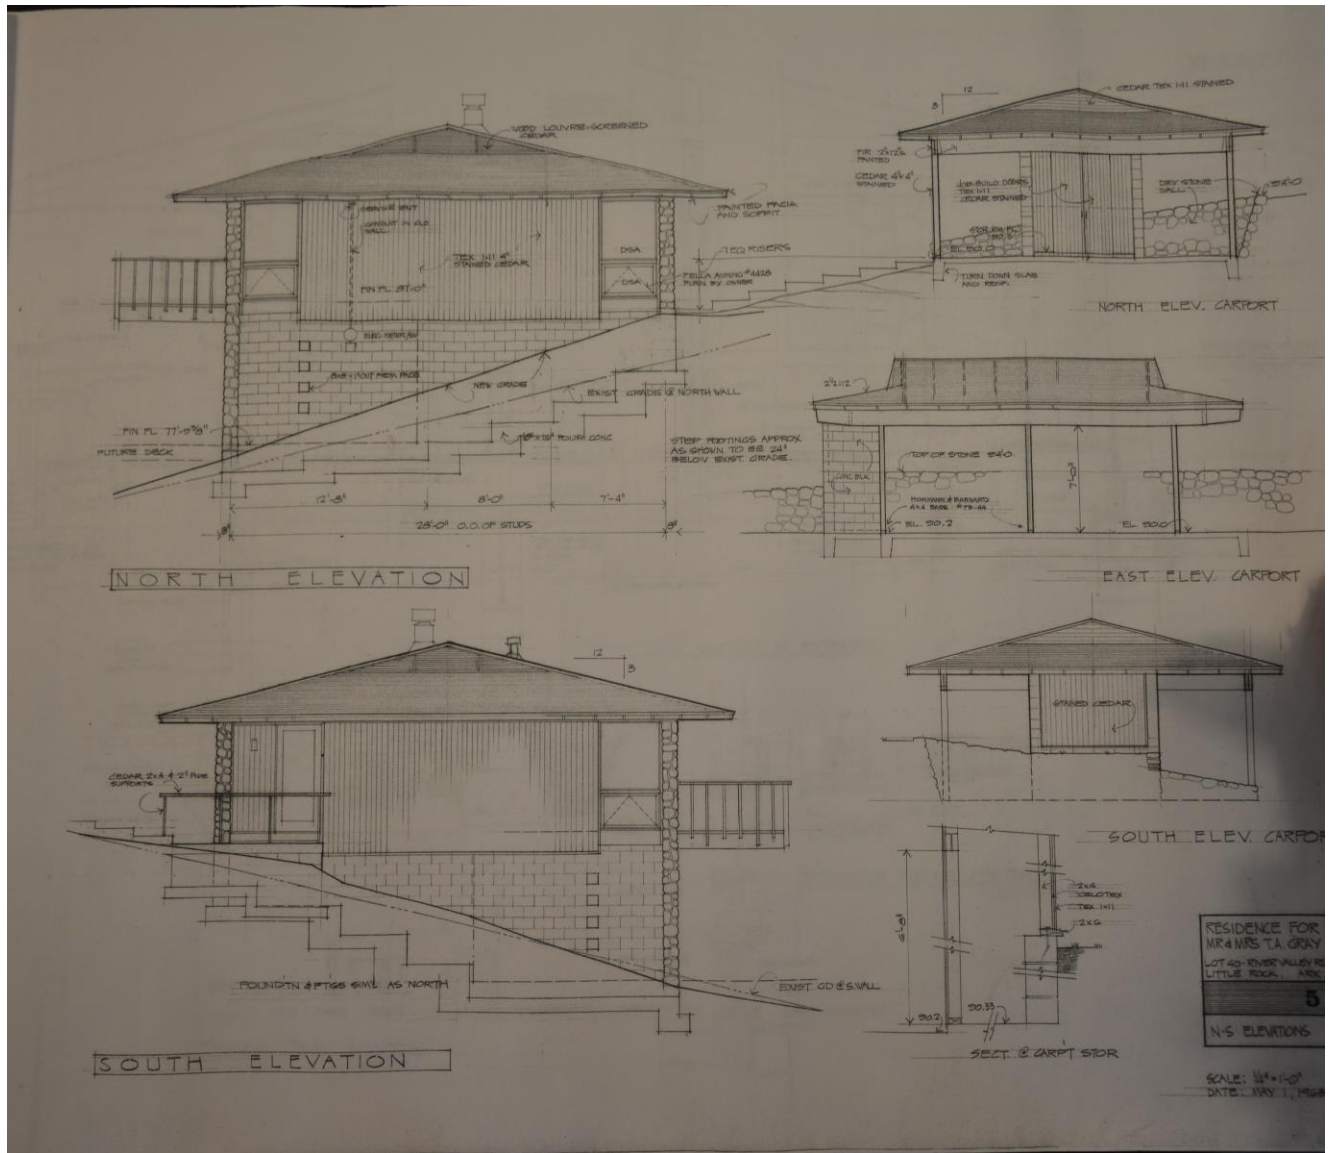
Side Elevations and Carport plan of the Thomas Gray House, 1963.
